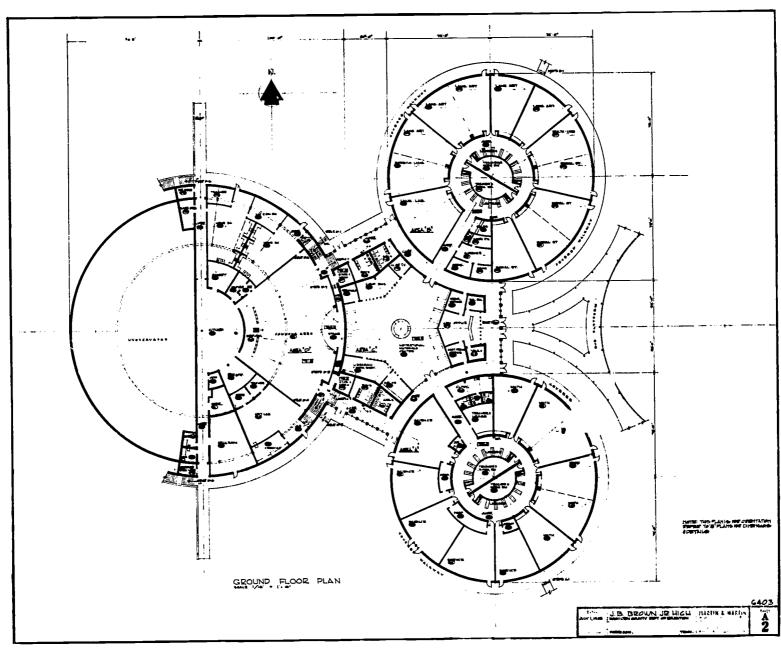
Floor plan of the J. B. Brown Junior High School
